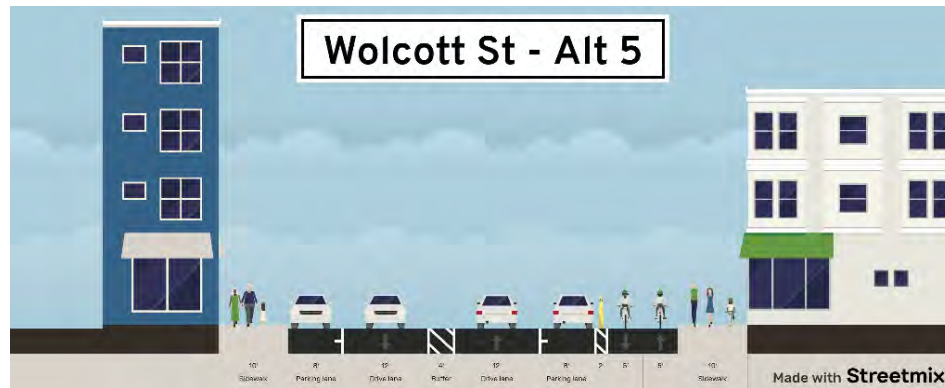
WOLCOTT ST ALTERNATIVE 5 PROPOSED CROSS SECTION
